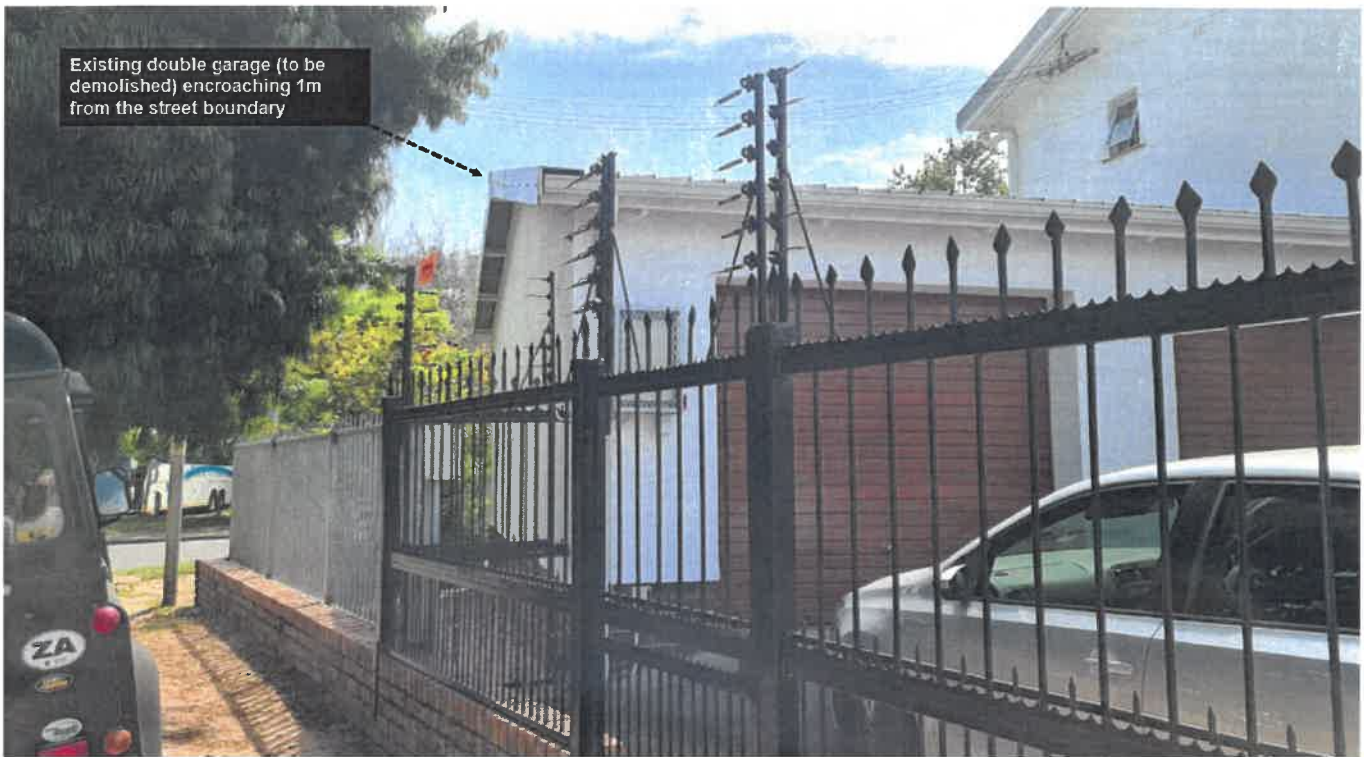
The existing double garage (to be demolished) that encroaches on the street building line
